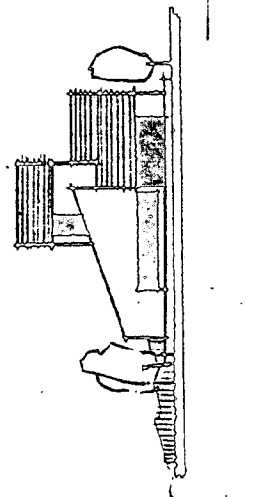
SCHEMATIC BUILDING ELEVATIONS
